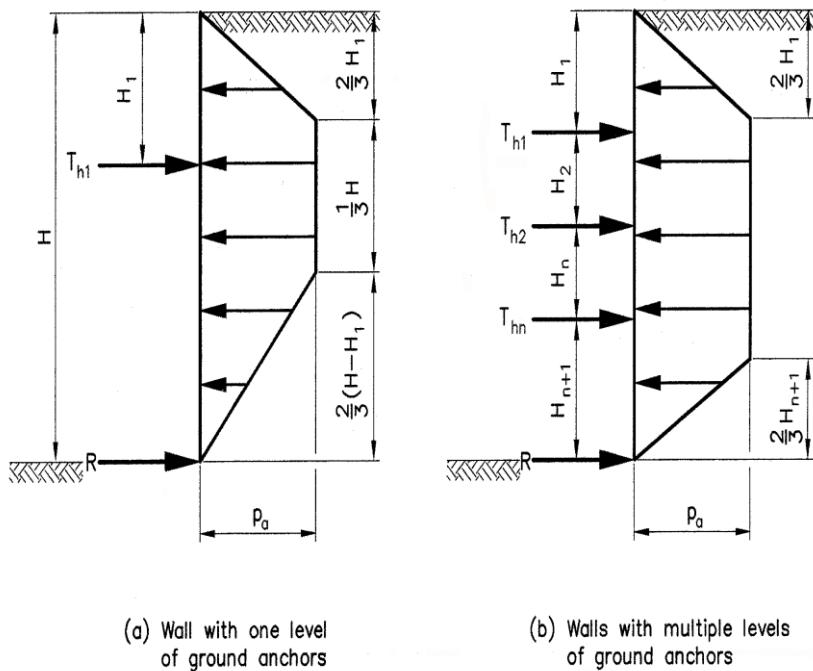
Apparent Earth Pressure Distributions for Anchored Walls Constructed from the Top Down in Cohesionless Soils
